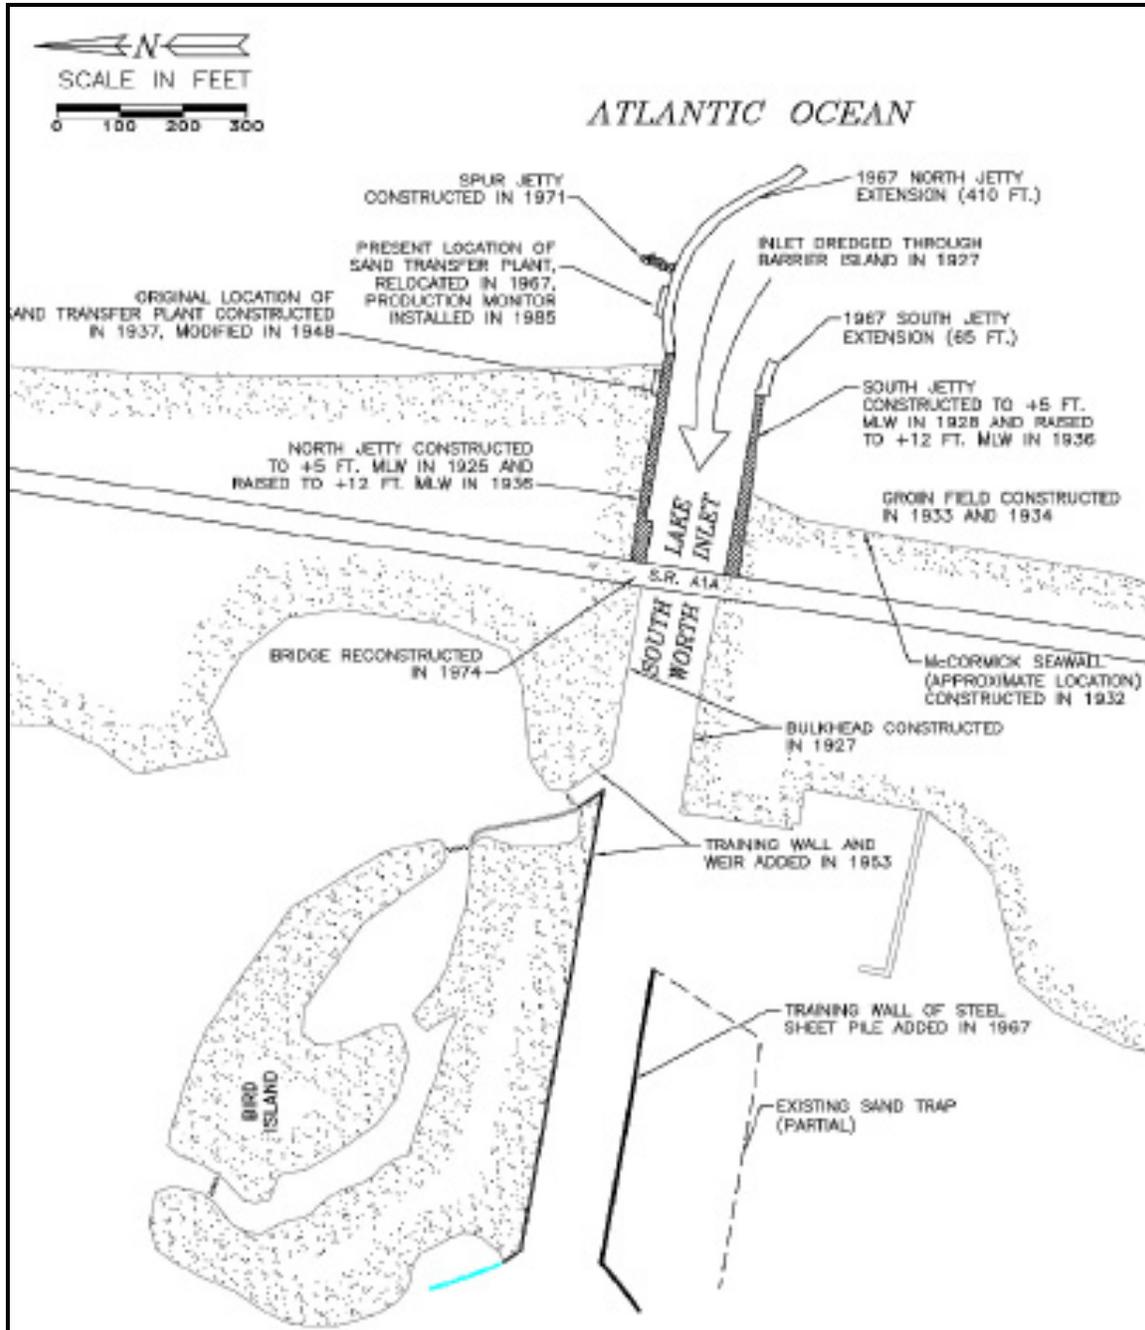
Overview of Improvements to South Lake Worth Inlet (source: PBC ERM)
